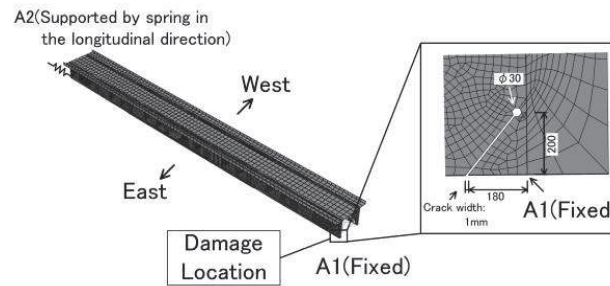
FE model of the bridge and pseudo cracks on plate girder.
